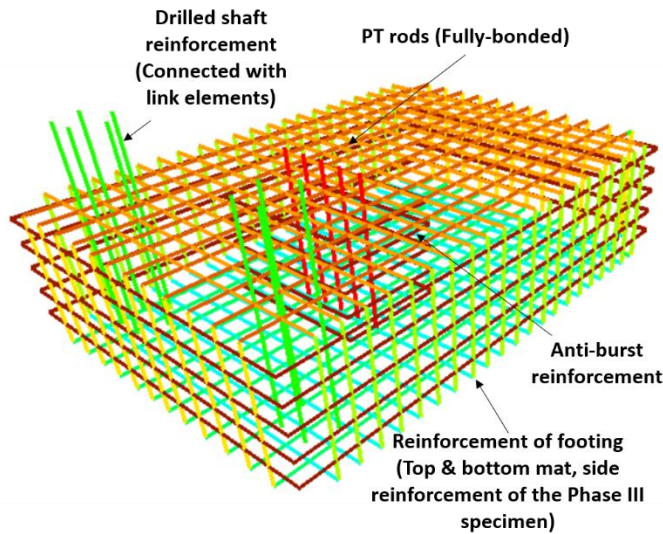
Truss elements for reinforcement in FE models for Phase III testing (Equivalent loading condition)
